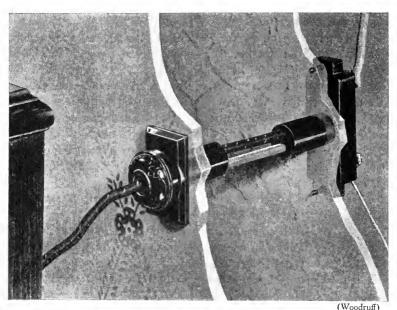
Suggested arrangement of radio aerial and ground wires. The lightning arrester is installed on outside wall of house. (Shown at right)
